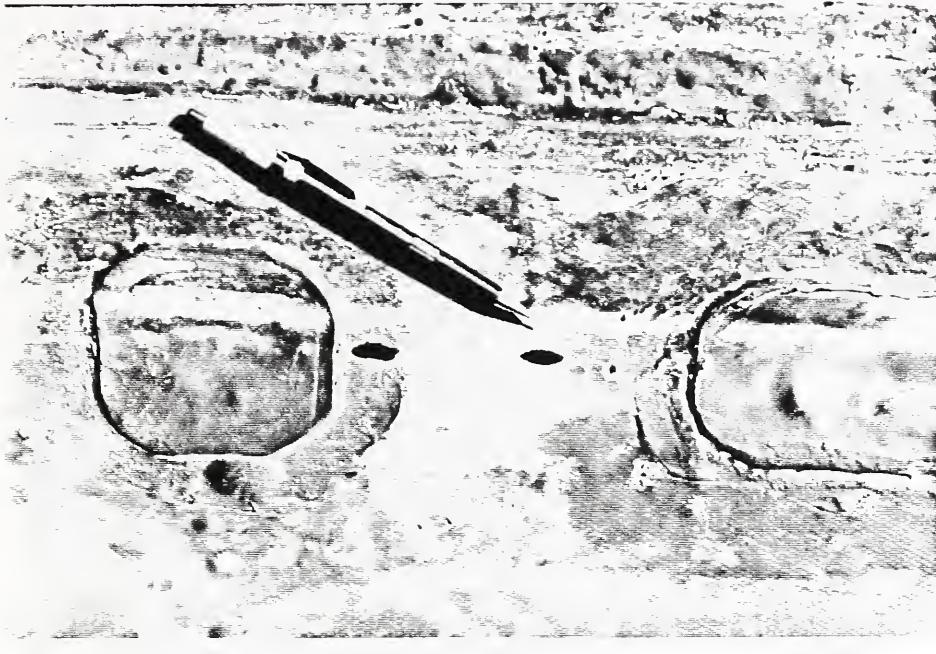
Cracks and patches in deteriorated base flashing
